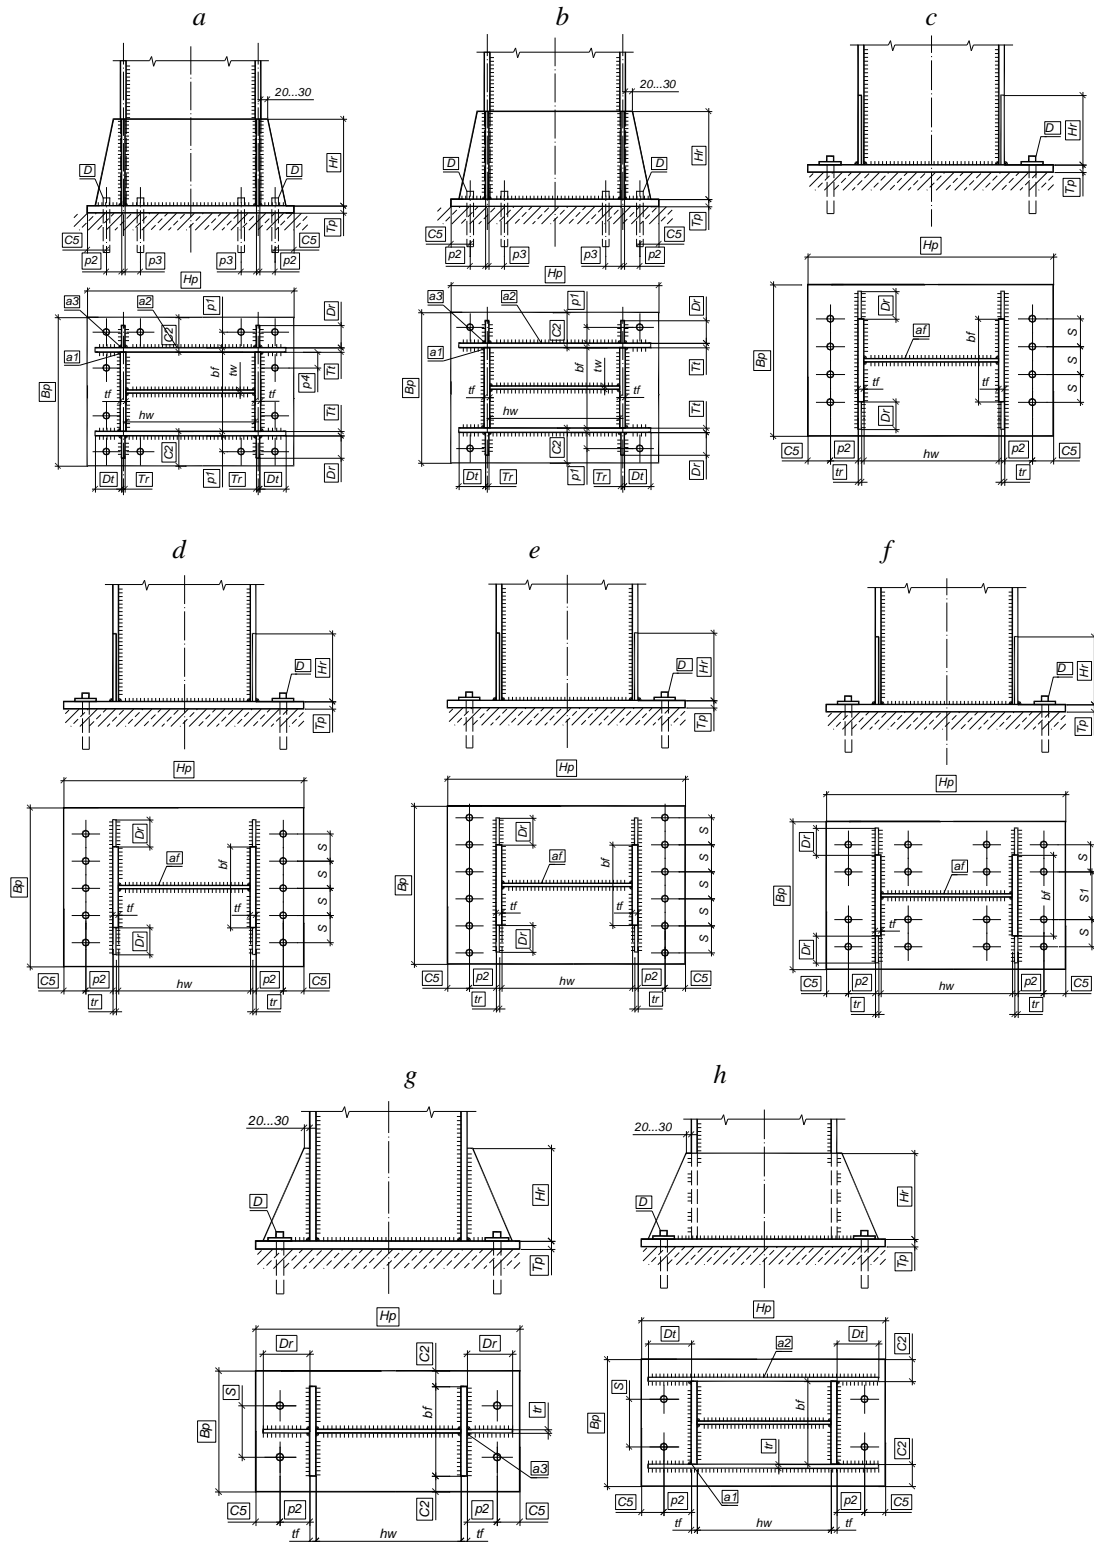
Types of designs for the joints of rigid column bases with wing plates and cantilever stiffeners
